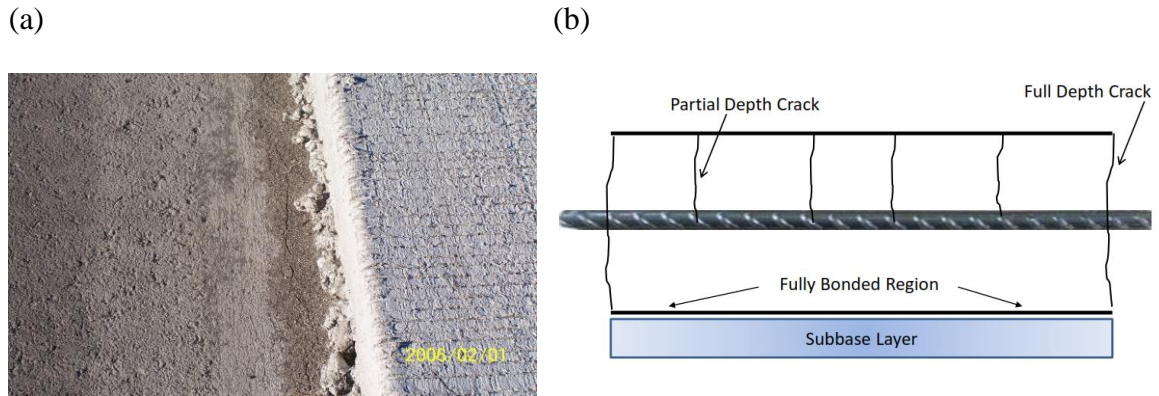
(a) Example of shear failure below the slab/subbase interface (b) Partial-depth cracking in a longitudinal segment of CRC pavement.
